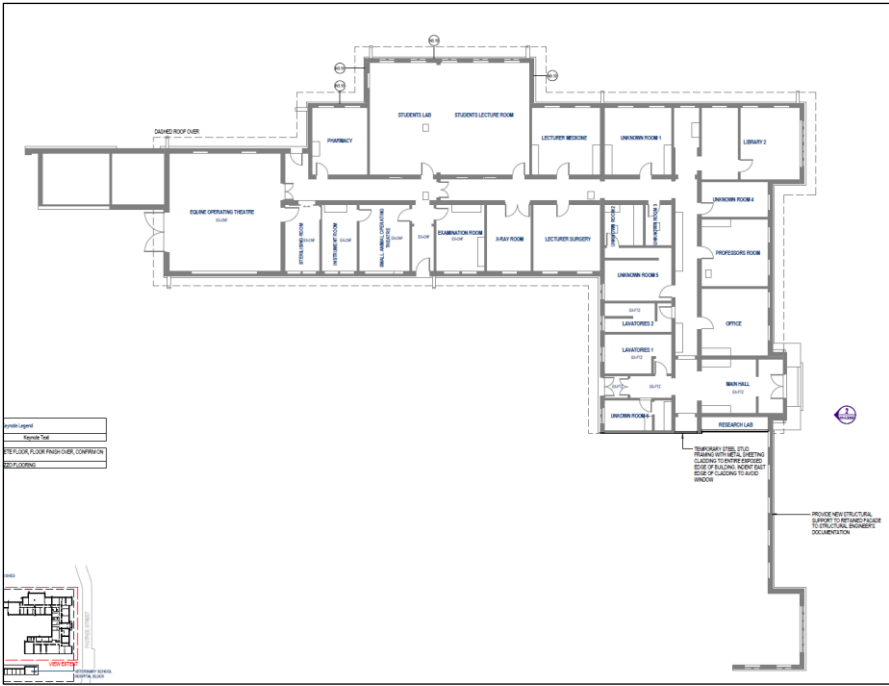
Proposed Floor plan after demolition (Source: Architectus drawing AR-3.20000).
